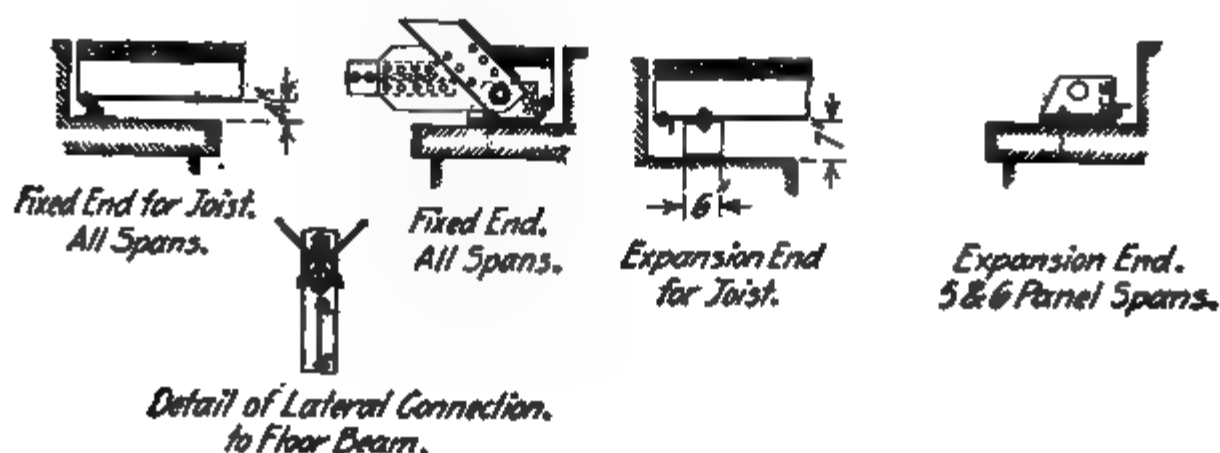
SHOES FOR RIVETED HIGHWAY BRIDGE. (AMERICAN BRIDGE CO.)
